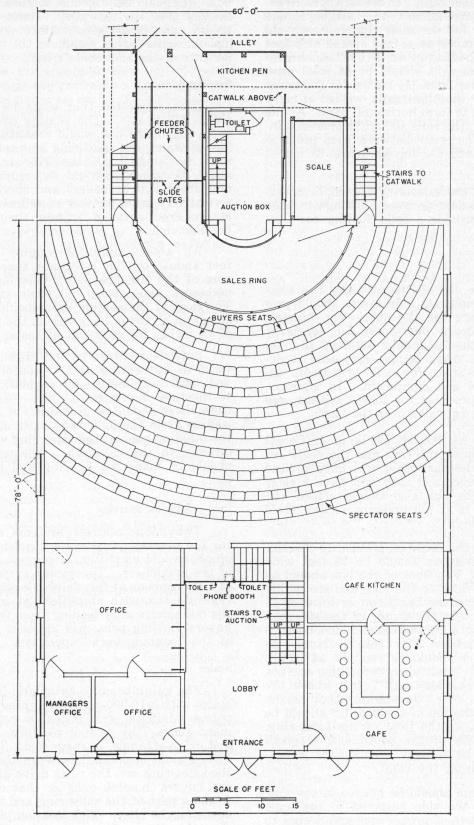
Floor plan of the suggested sales barn for a Texas livestock auction market.
